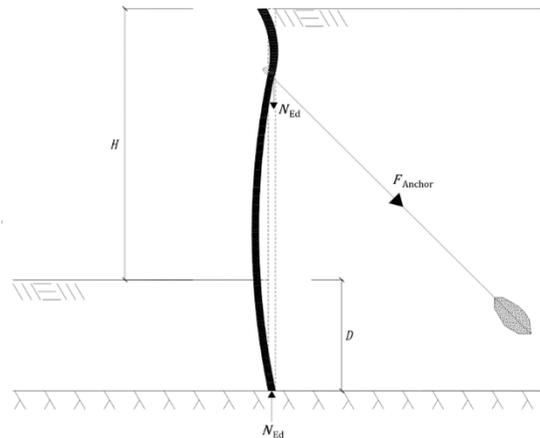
Retaining wall with ground anchor drilled into the Precambrian bedrock.
